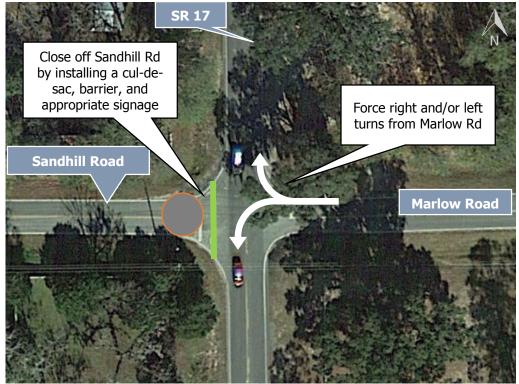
SKETCH DIAGRAM OF RECOMMENDED CUL-DE-SAC ON SANDHILL ROAD
